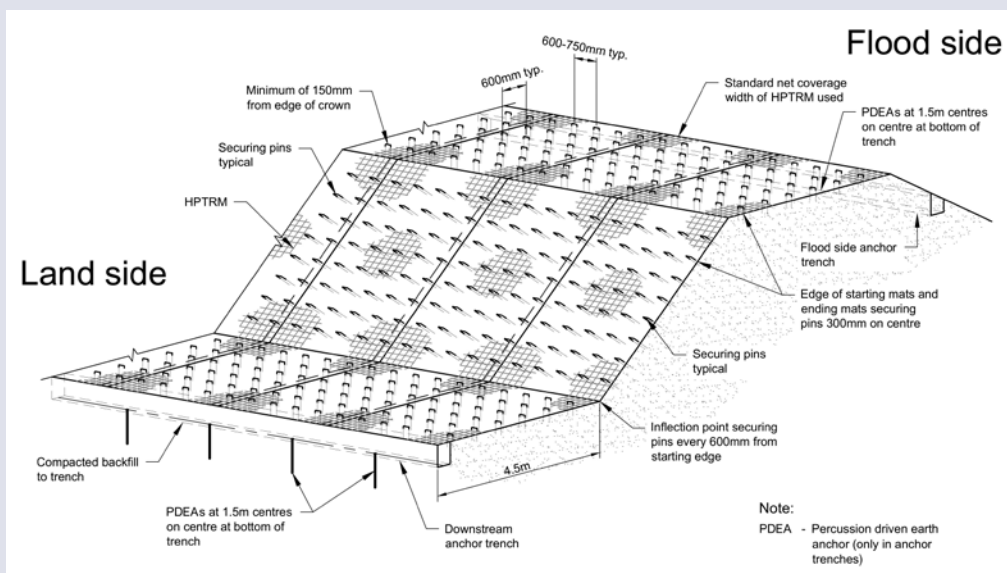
Recommended HPTRM trenching and anchoring requirements (from USACE, 2012a)
